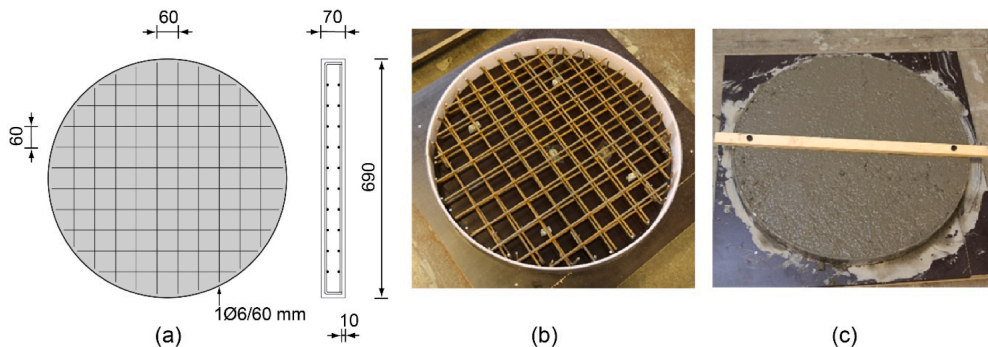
Reinforced concrete slab specimen: (a) specimen size, (b) mould used to cast the slab and (c) view of the cast slab (units: mm).
